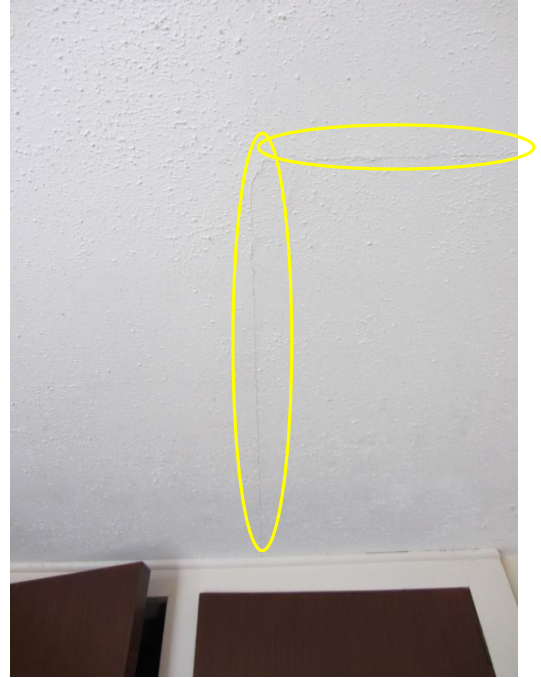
Hairline Cracking along Ceiling Lining Joints
